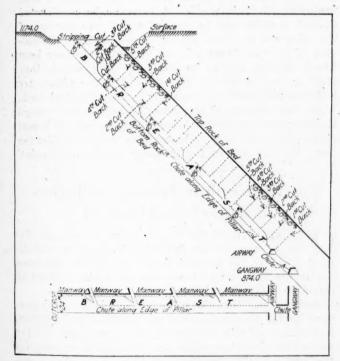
PLAN OF MINING FOLLOWED NEAR THE EDGE OF A BARRIER PILLAR
